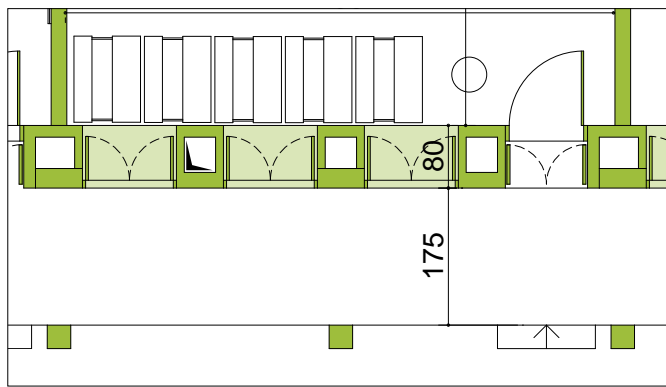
PU's first system of classroom wall (Jaramana First - Ground Floor)
